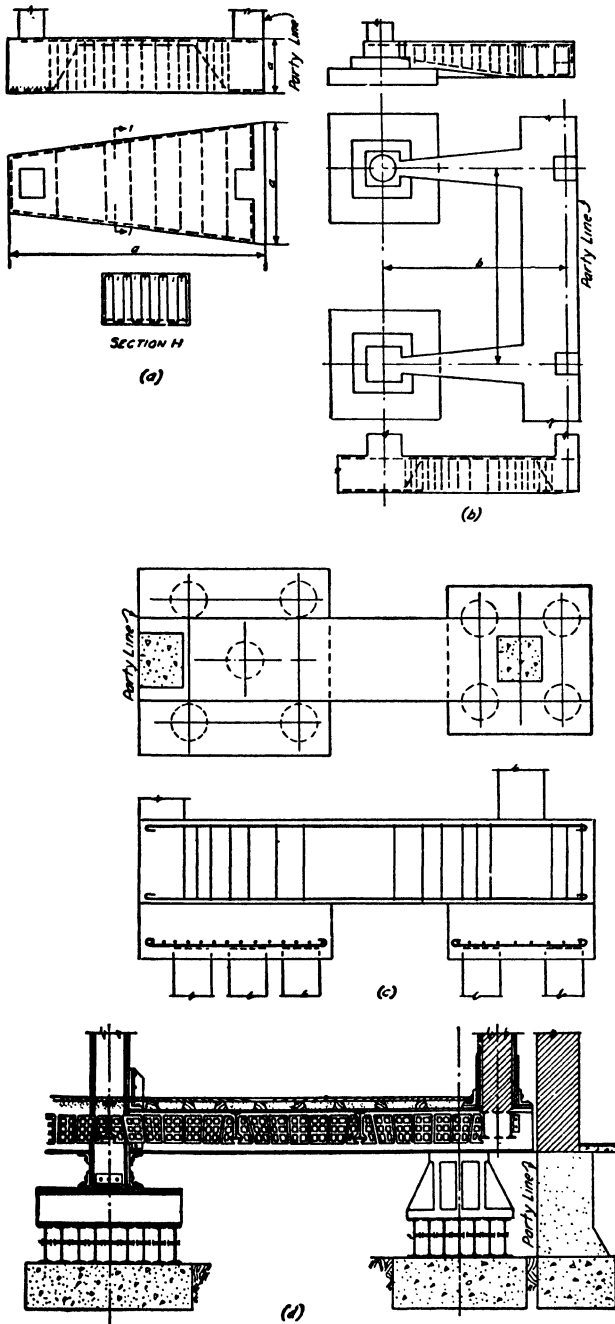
Combined and Cantilever Footings. (a) spread mat; (b) beam and mat; (c) beam and pile caps; (d) eccentric steel grillage and cantilever beam.
